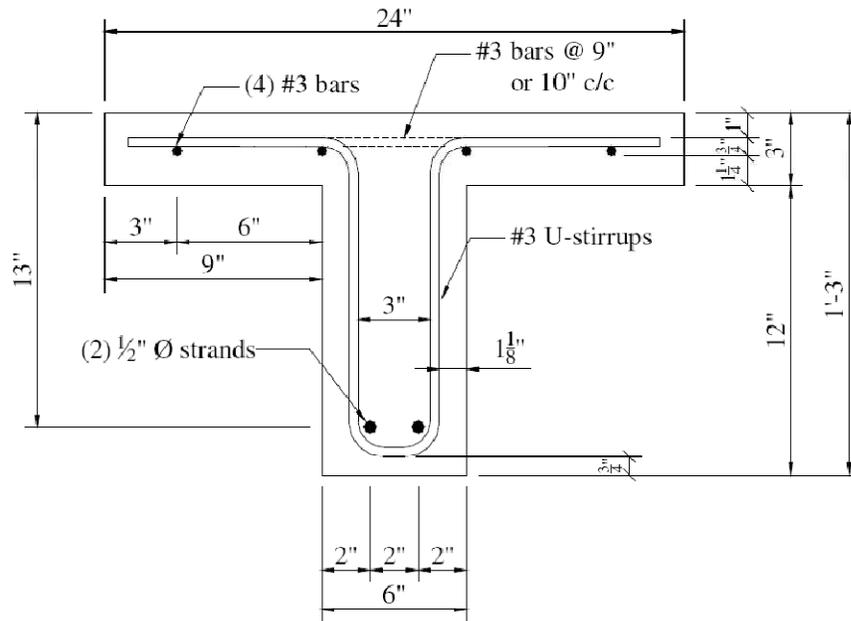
Eccentrically Prestressed Concrete T-beam Cross Section (Levy 2007)
